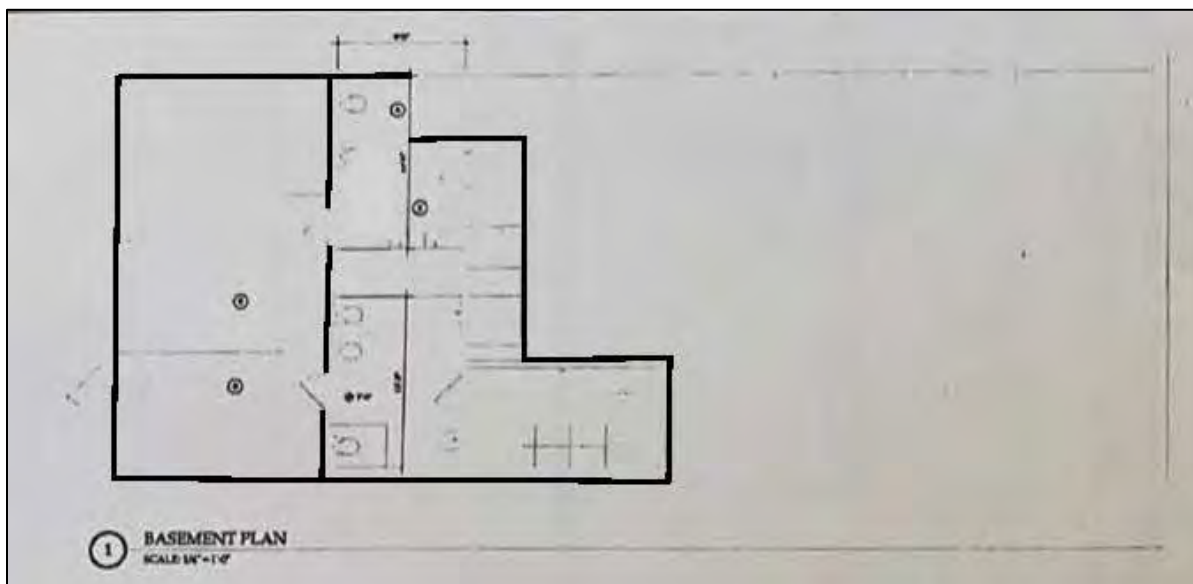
Basement floor plan of Union Street School, showing existing conditions (Plan by Karl Riedel Architecture, PC, 2018).
